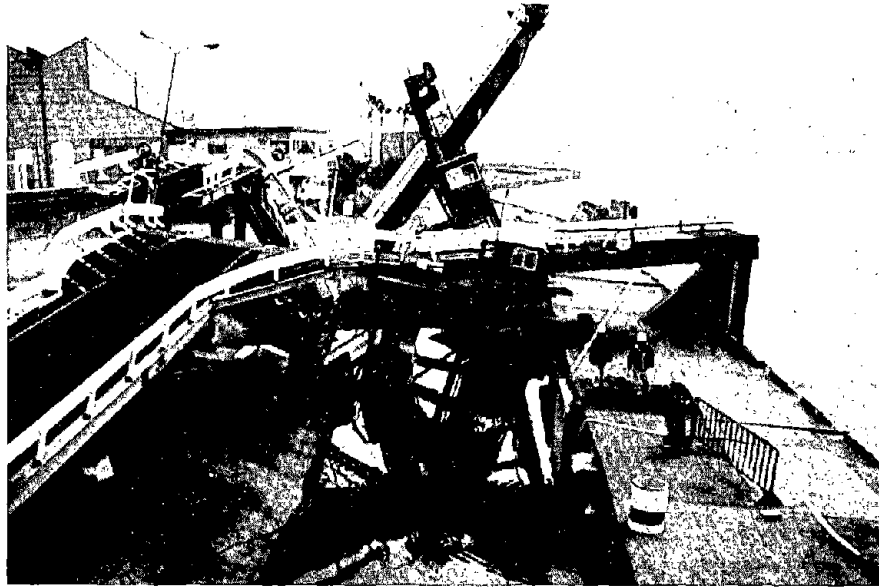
Ramp structure at Higashi-Kobe ferry pier.
